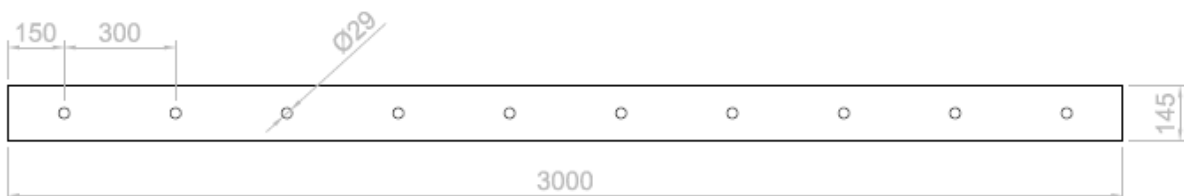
The dimension of each lamination was 3000x45x145mm. 10 steel bars were used with a space of 300mm between them.
